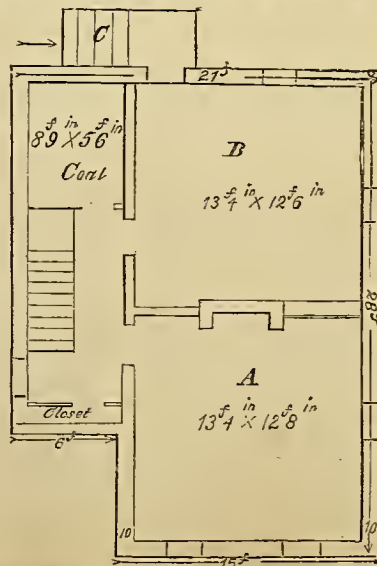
THE CELLAR OR BASEMENT—FLOOR PLAN.
